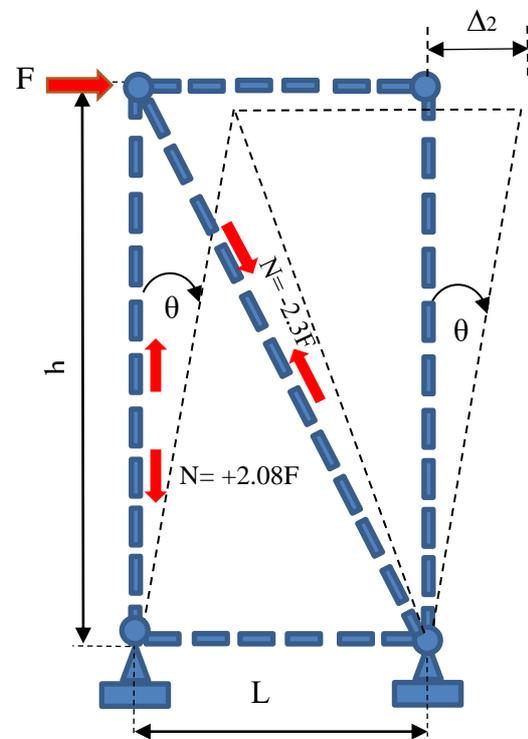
2: Loaded and unloaded states of diagonal bracing wall unit.
